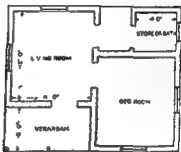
PLAN OF A TWO-ROOMED HOUSE
